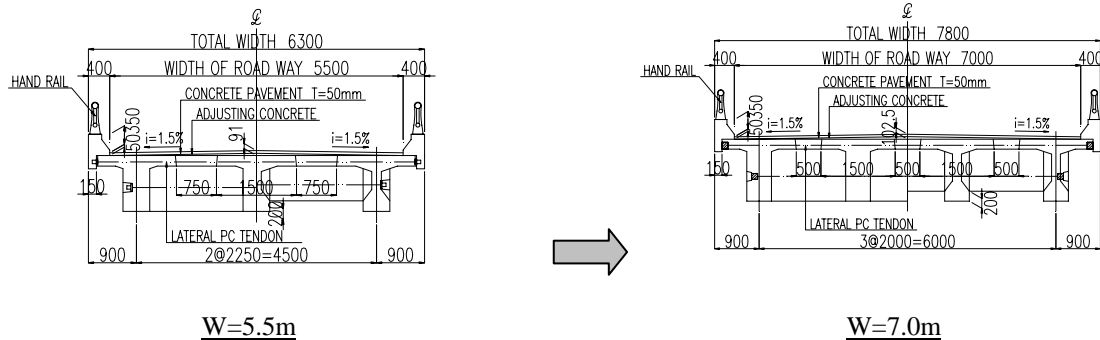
Widening of Bridge Formation Width (Ngoi Ngan Bridge)
